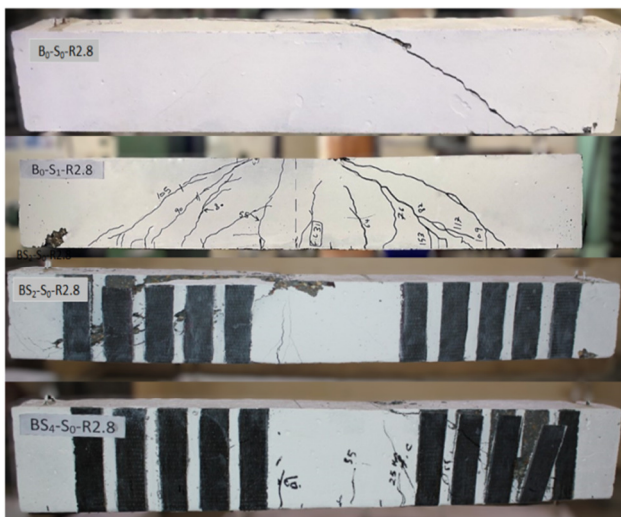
Cracking patterns of the tested beams at ratio 2.8.
